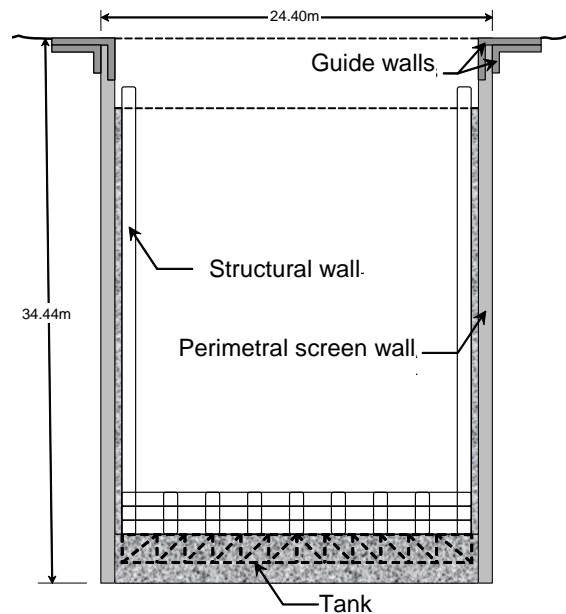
Shaft constructed by the flotation method with perimetral wall.
